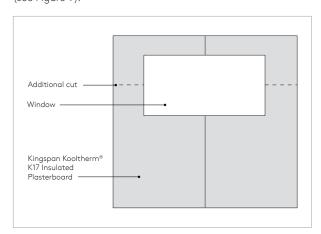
Kingspan Kooltherm® K17 Insulated Plasterboard Installation Details for cutting.
